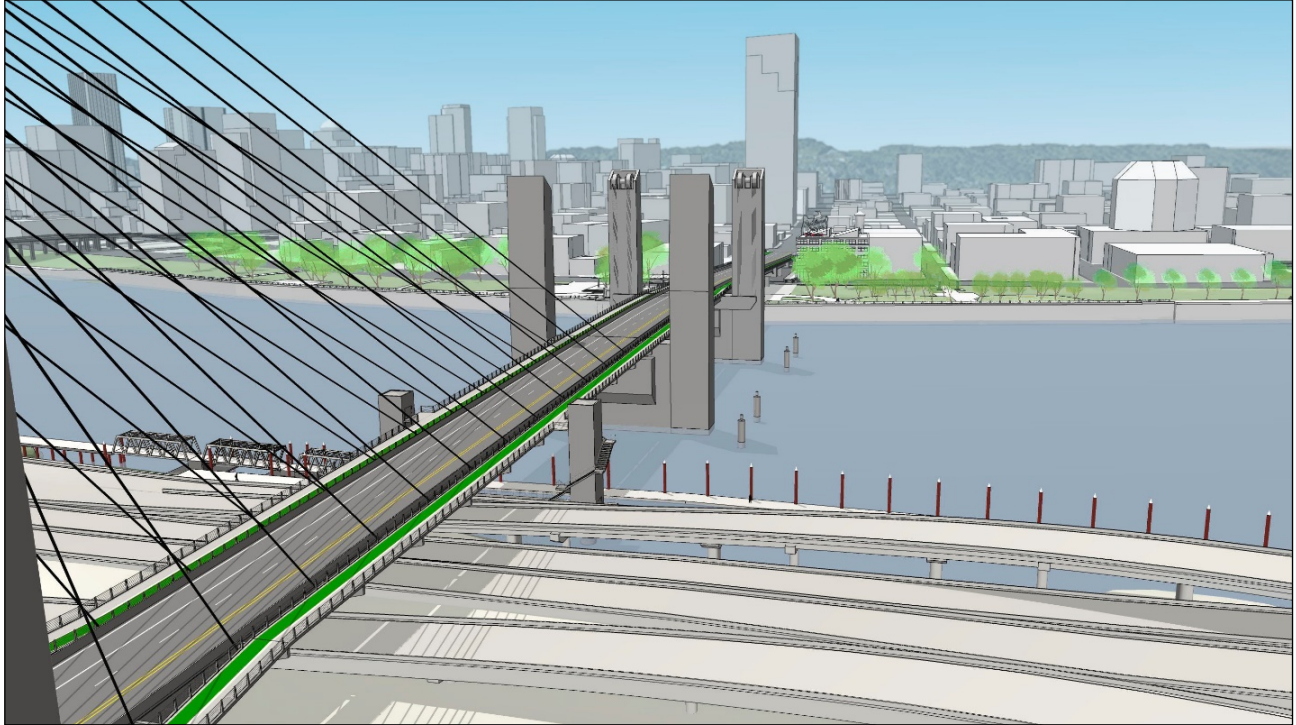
Span Combination 4 (girder west approach, vertical lift central span, cable supported east approach), artist's rendering, view looking southwest (Fat Pencil Studio, 2021).
